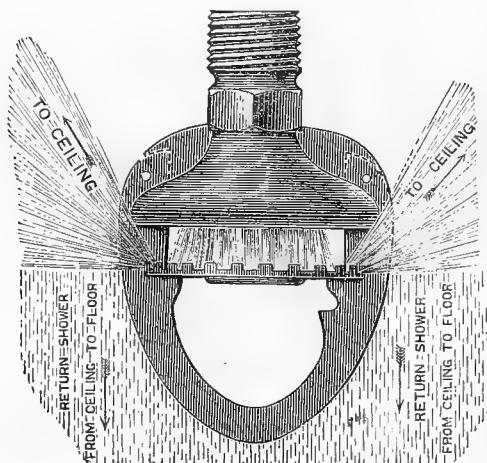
SECTIONAL VIEW OF GRINNELL'S SPRINKLER IN ACTION.
